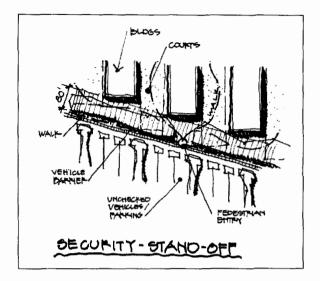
c shows the SDC-required stand-off distance between parking and buildings for a medium level of security. This requirement is a stand-off distance of 80 feet from building to unchecked vehicles.
